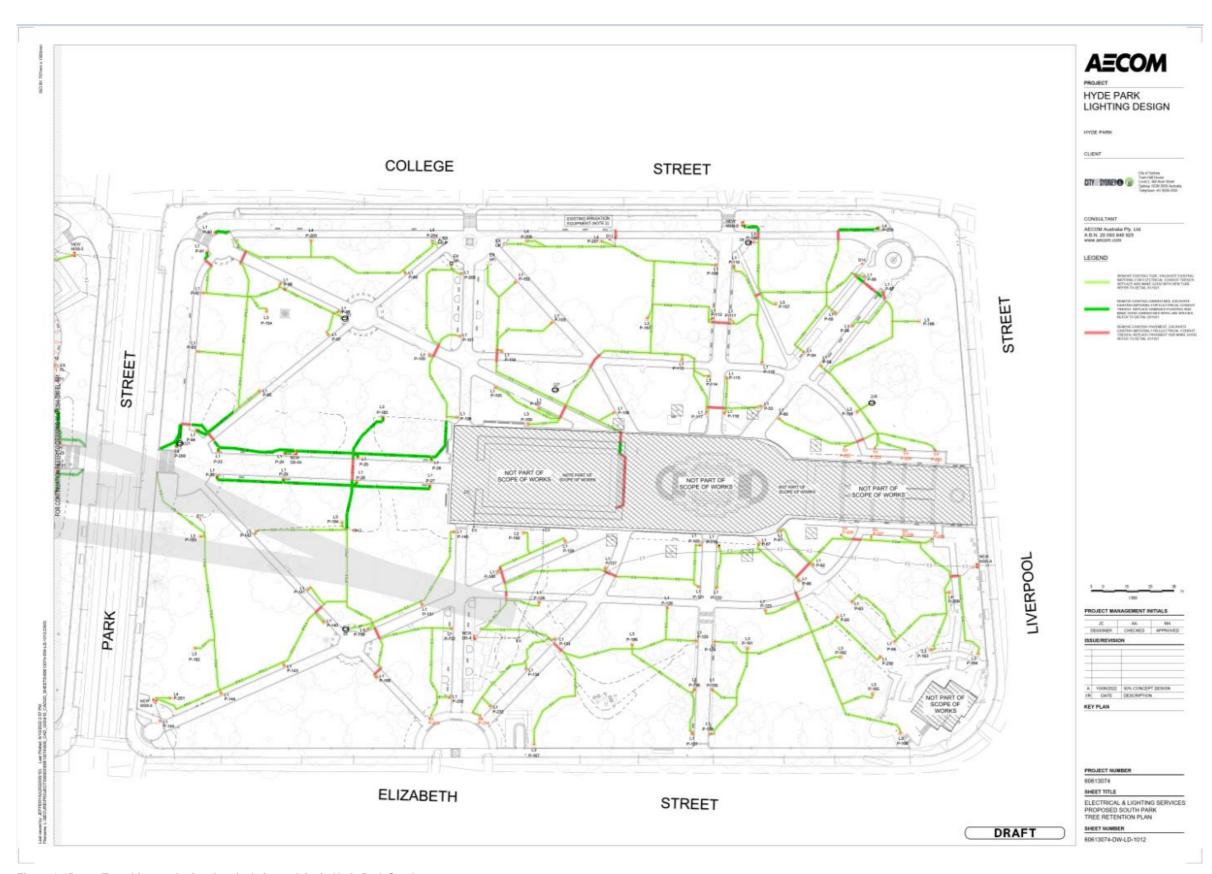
Trenching works for electrical pit conduits in Hyde Park South
